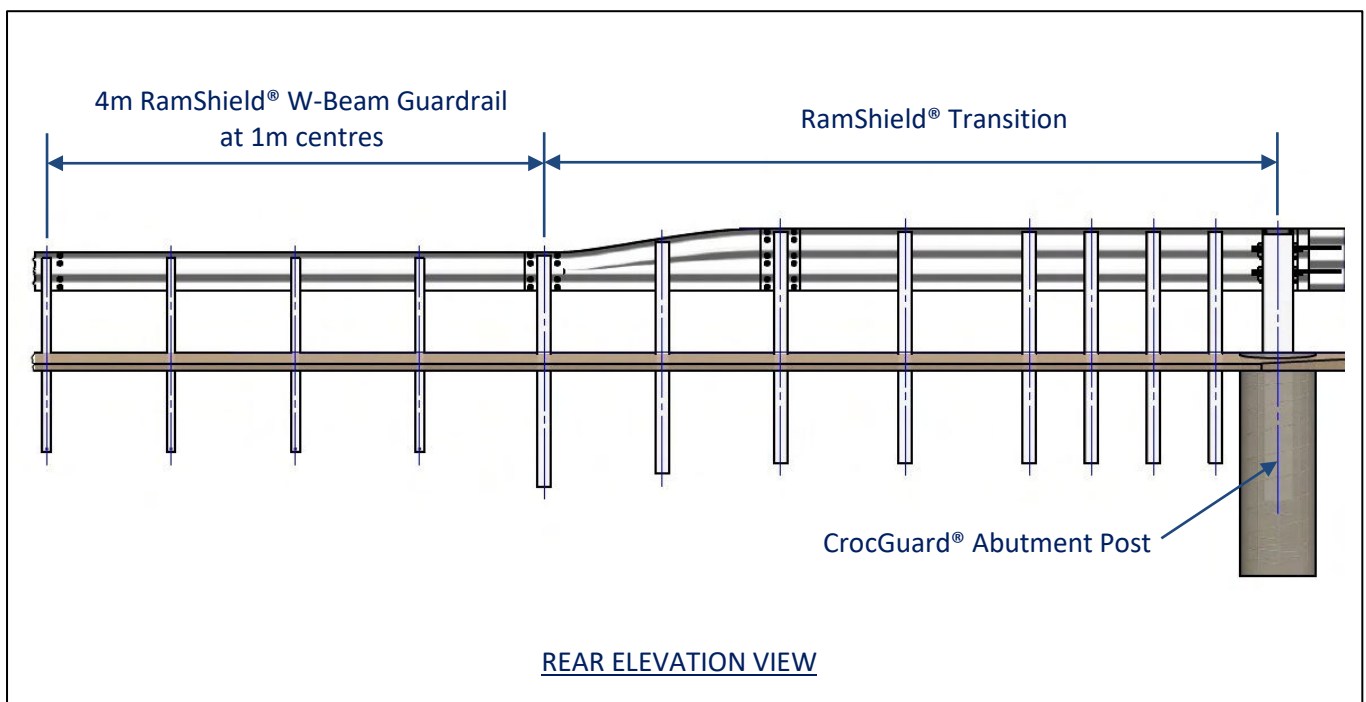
CrocGuard® Connection to RamShield® W-Beam
